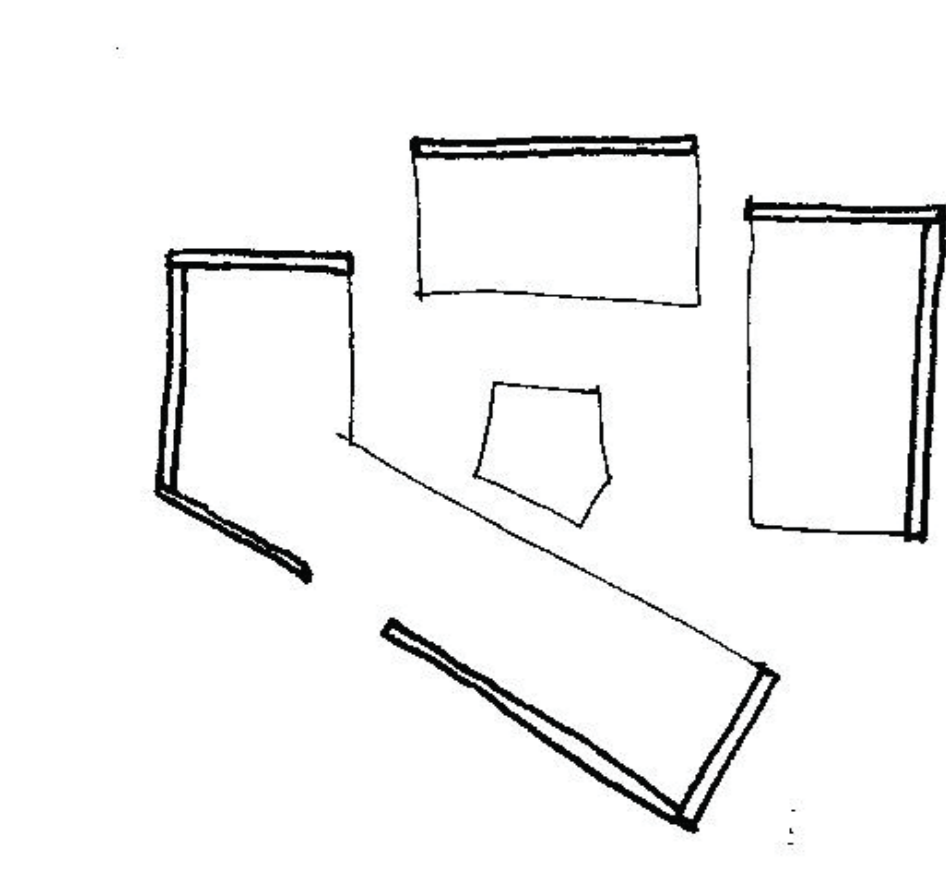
Conceptual sketch of approach to the existing plan
